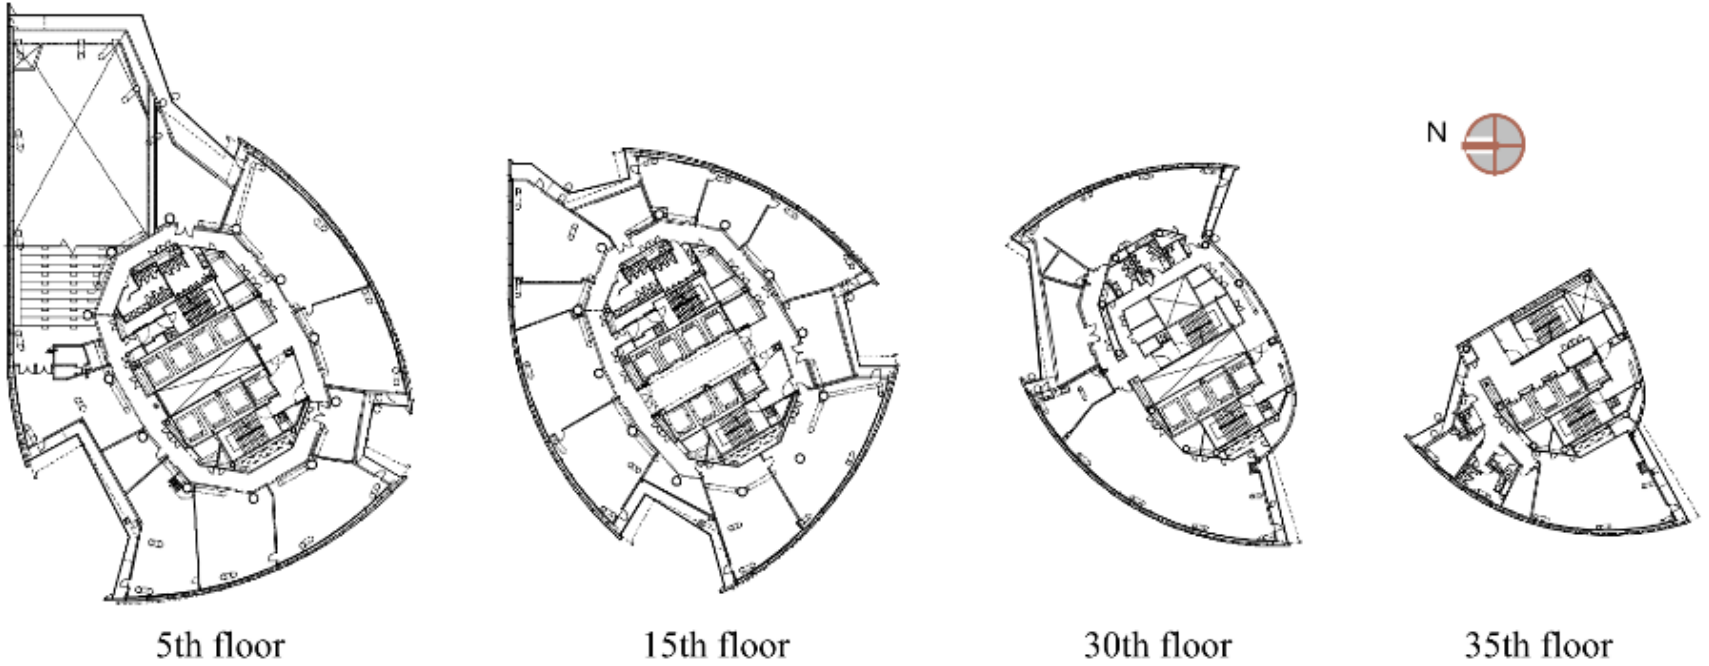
Floor plans of Mode Gakuen Spiral Tower
